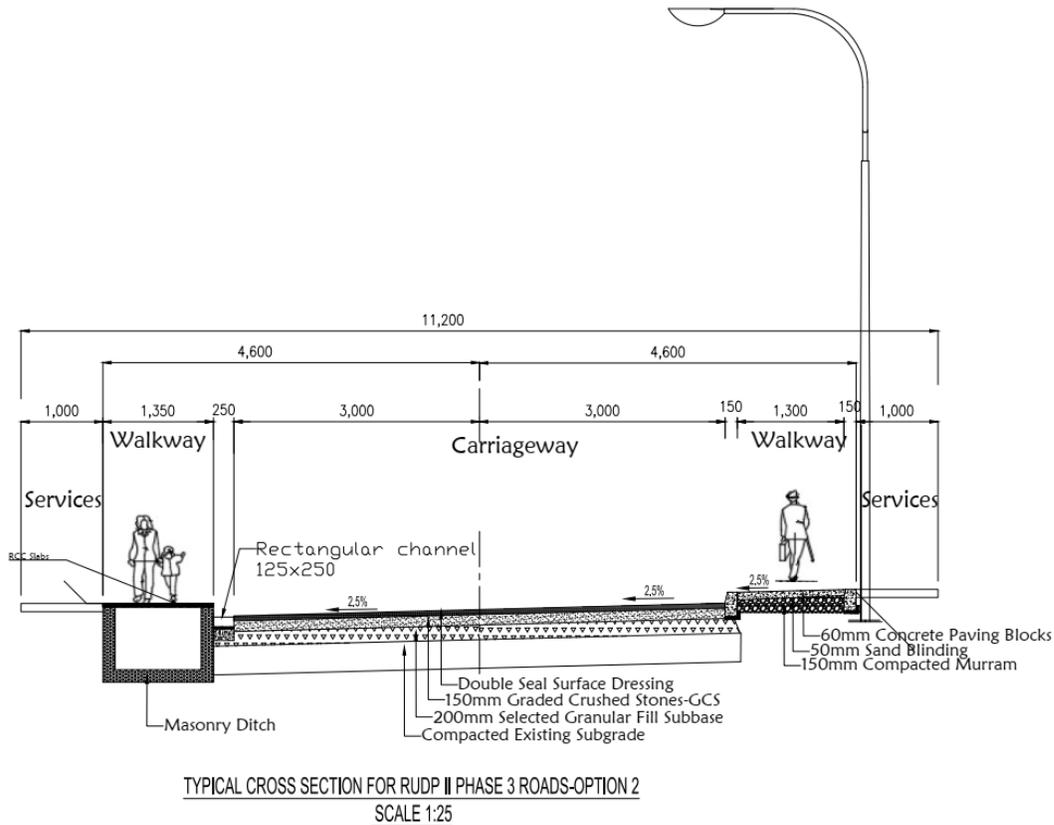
Typical Street Cross Section Option 2 (width 11.20m)
